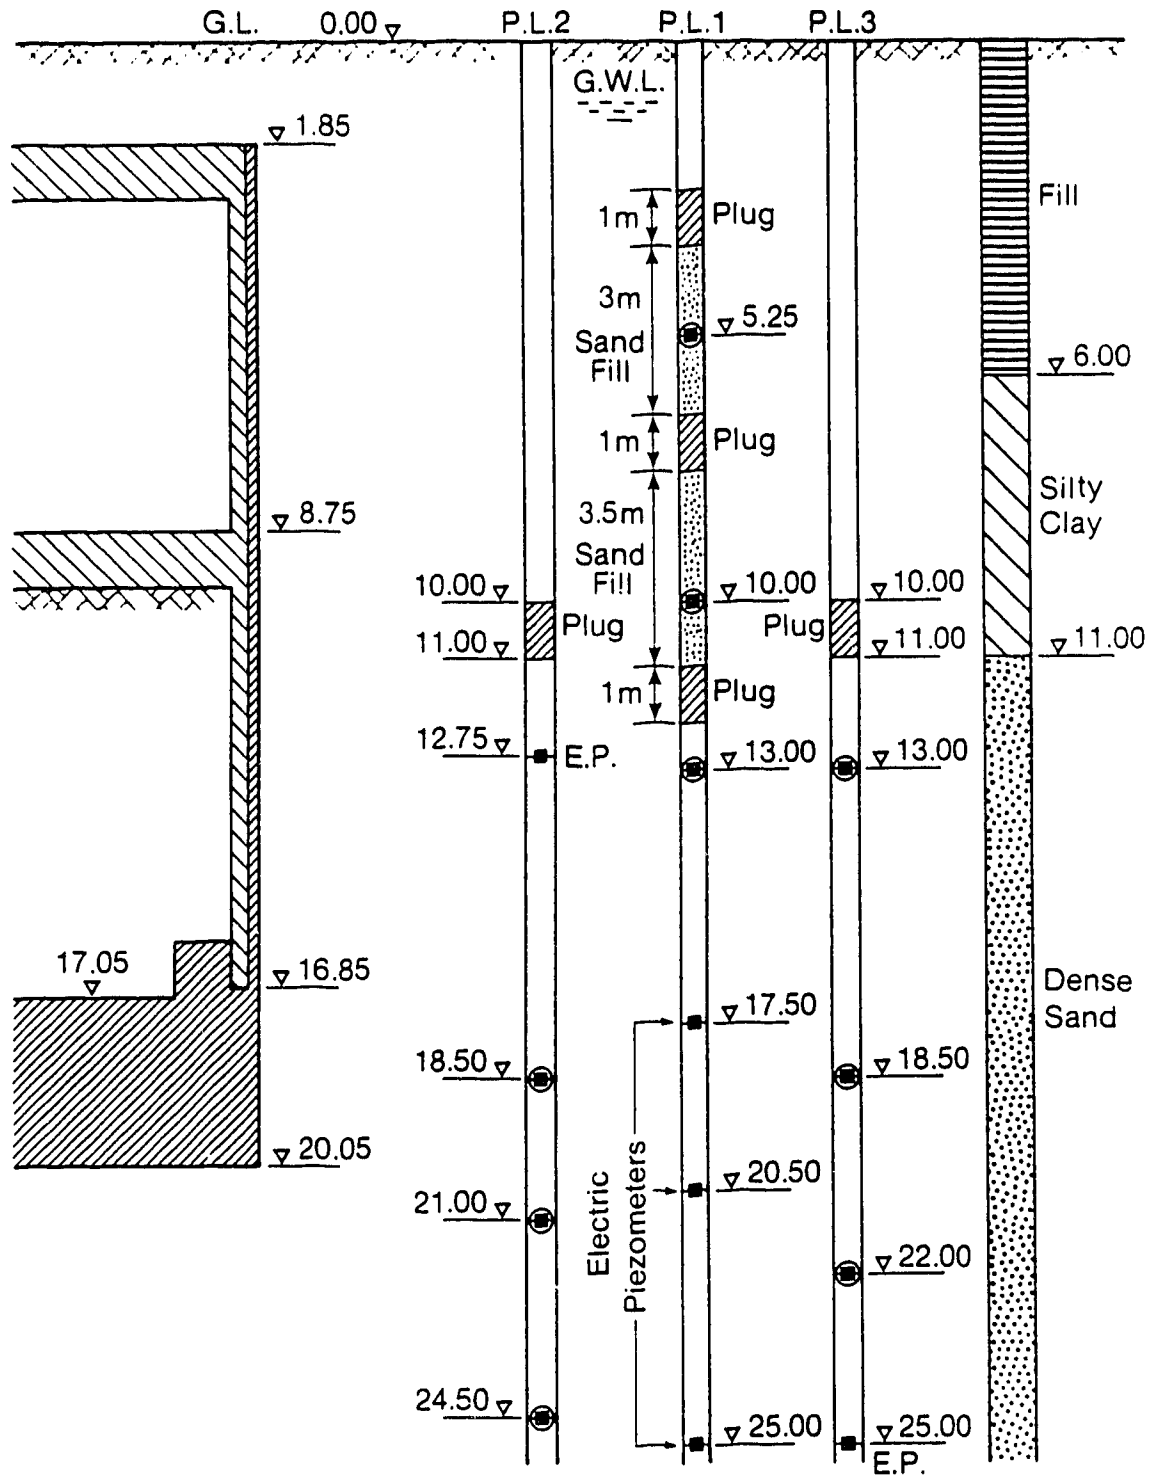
The Piezometer Line Details at the Tunnel Test
